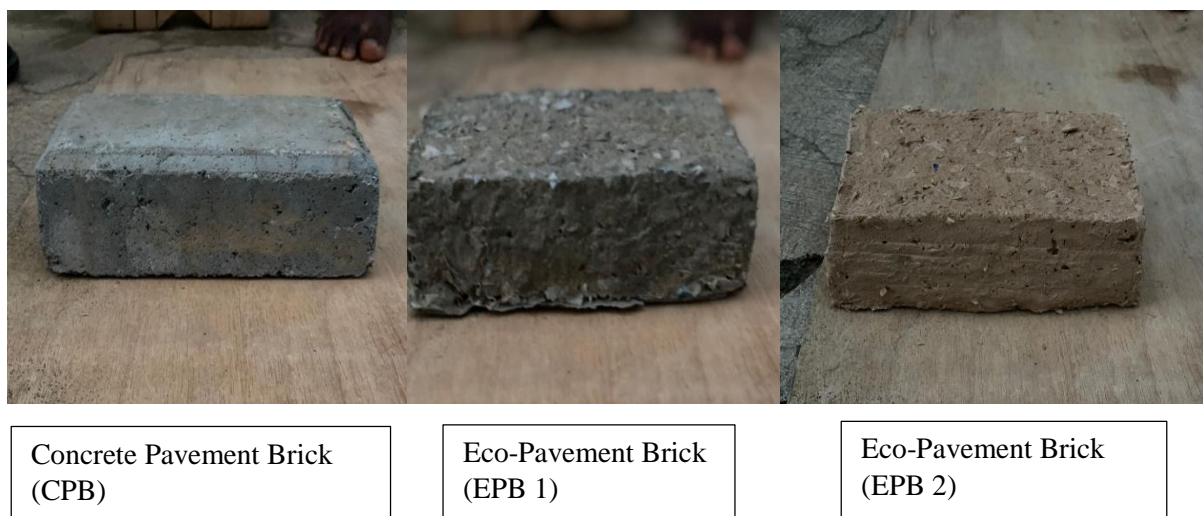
Constructed eco-pavement bricks and an acquired concrete brick.
